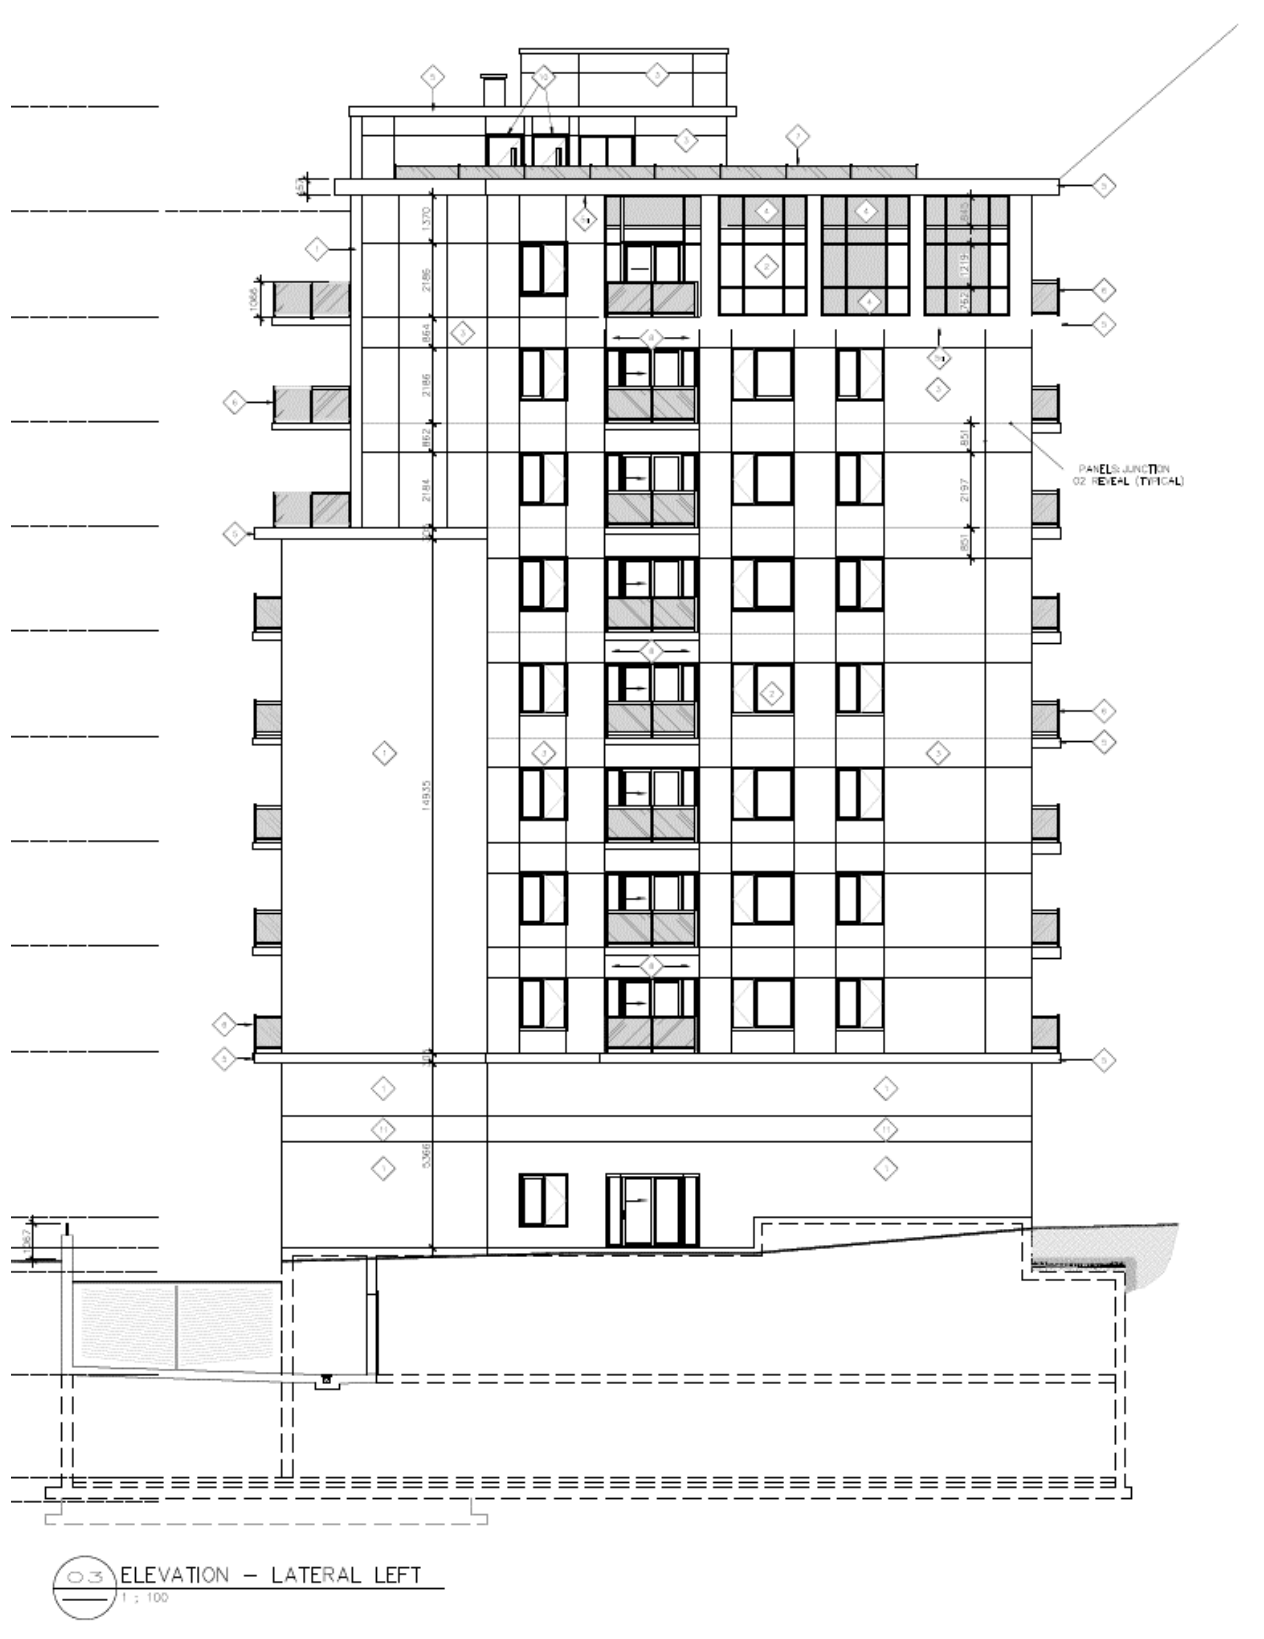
Proposed Building Elevation – West Elevation (Yves Lussier Architect, October 27, 2022)
